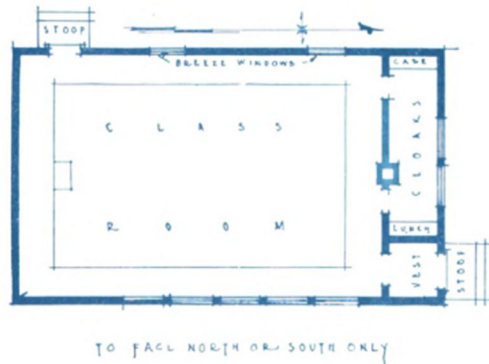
One Teacher School Building plan in *For Better Schoolhouses*.
